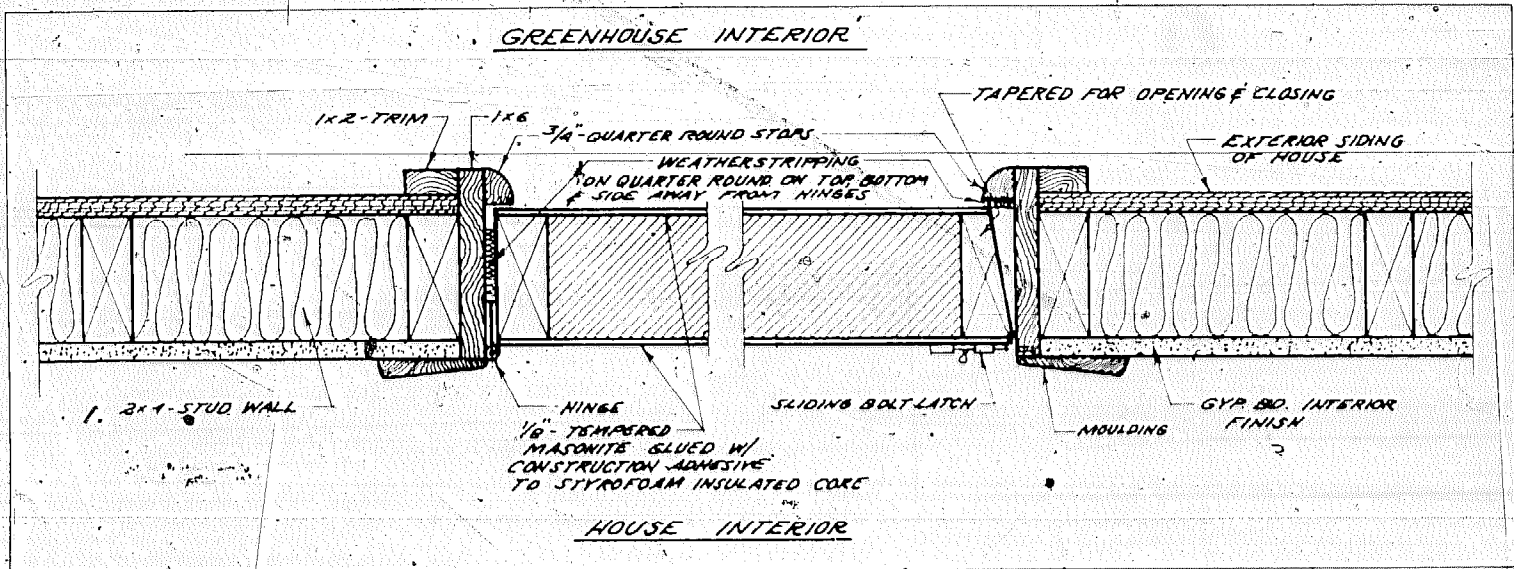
Horizontal wall section of side-hinged door type vent (from attached greenhouse through solid wall of house)
